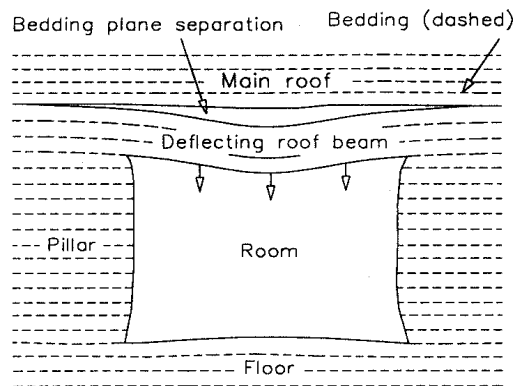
A common mode of roof rock failure in underground stone mines
